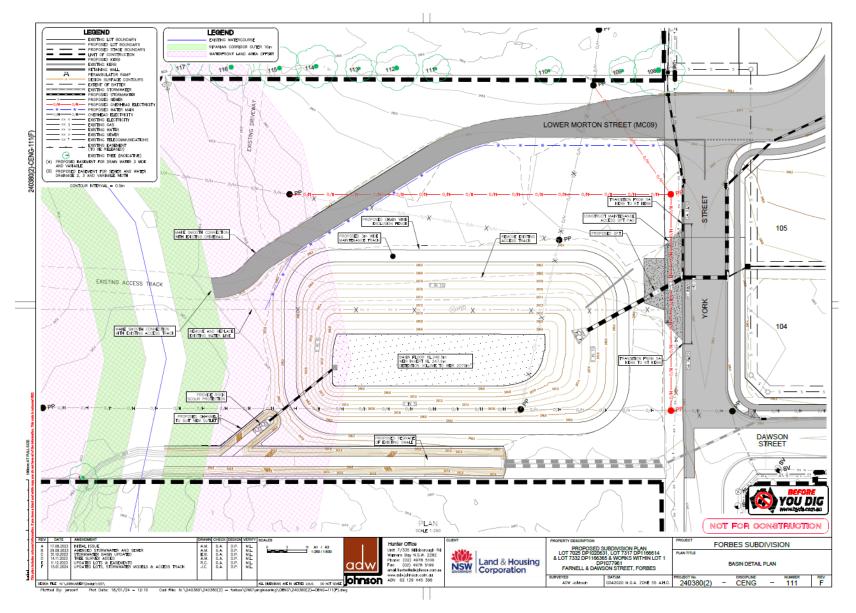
Proposed Subdivision Plan (magnified stormwater basin design).
